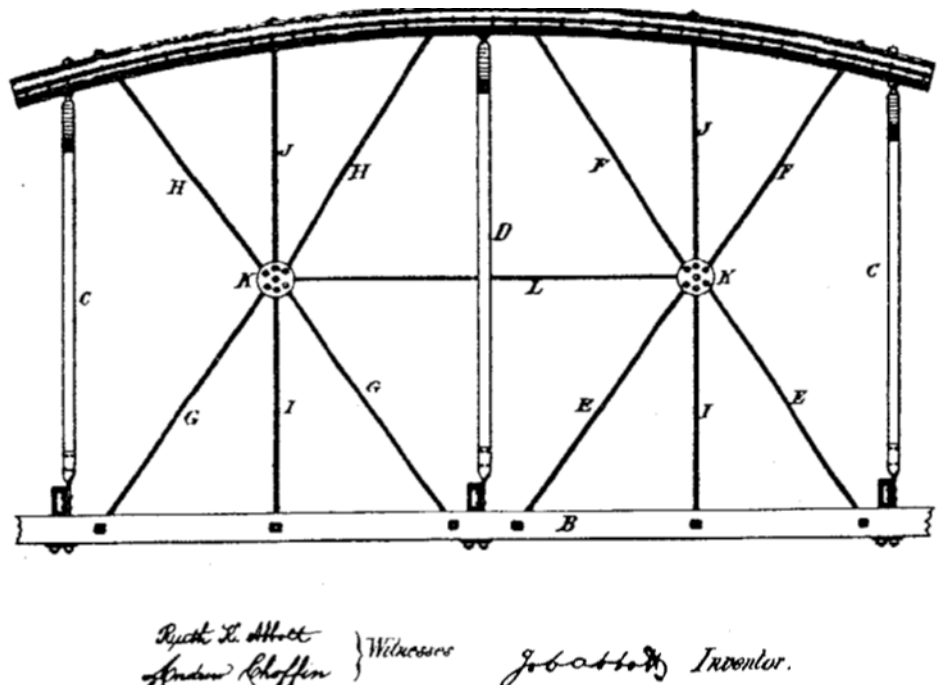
The bridge has a double-panel diagonal arrangement that was patented in America by Job Abbott. (Image from United States Patent Office)
